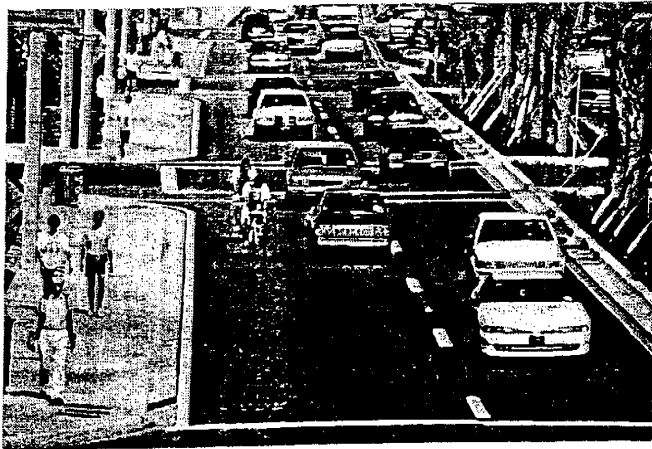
Example of a signed shared roadway, wide outside lane (Source: www.pedbikeimages.org/Dan Burden)
